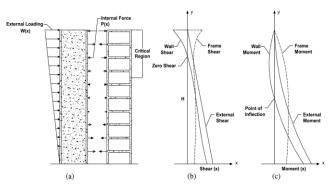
Forces in RC dual system: (a) horizontal interaction between wall and frame; (b) typical distributions of the shear force in wall and frame; and (c) typical distributions of moments through wall and frame
